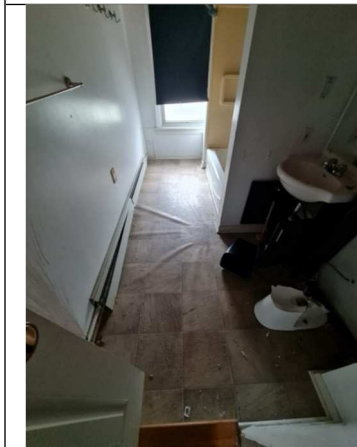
Flood caused water damage to floors, likely underlying damage.
